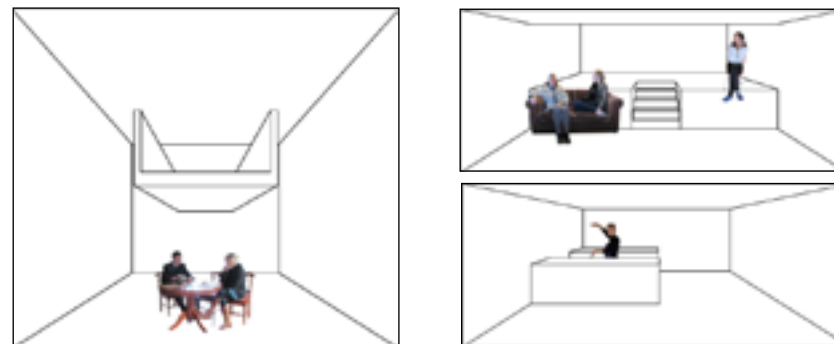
Design tactics utilized in House in Sapporo to create different areas within the same open plan volume. Left; Lowered ceiling under mezzanine floor. Right above; raised floor. Right below; kitchen bench
